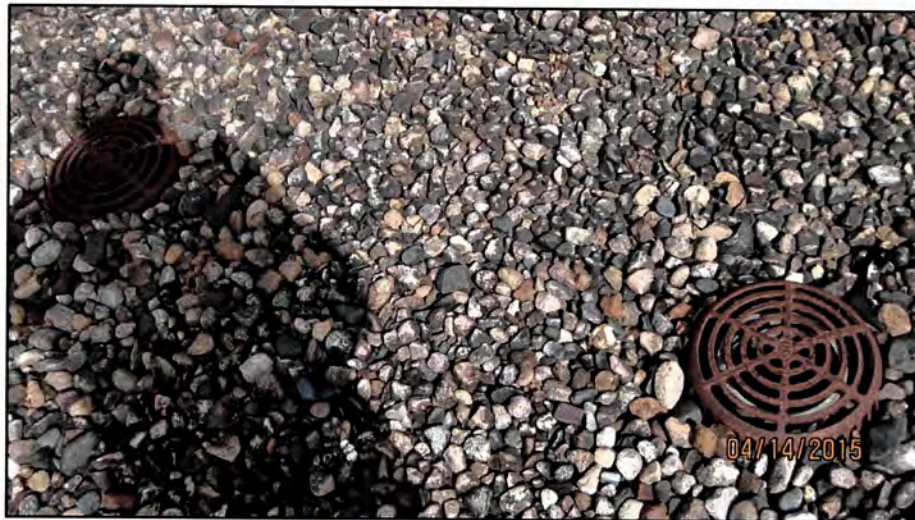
Recommend that all roof drain seals, including over flow drains, be replaced.
